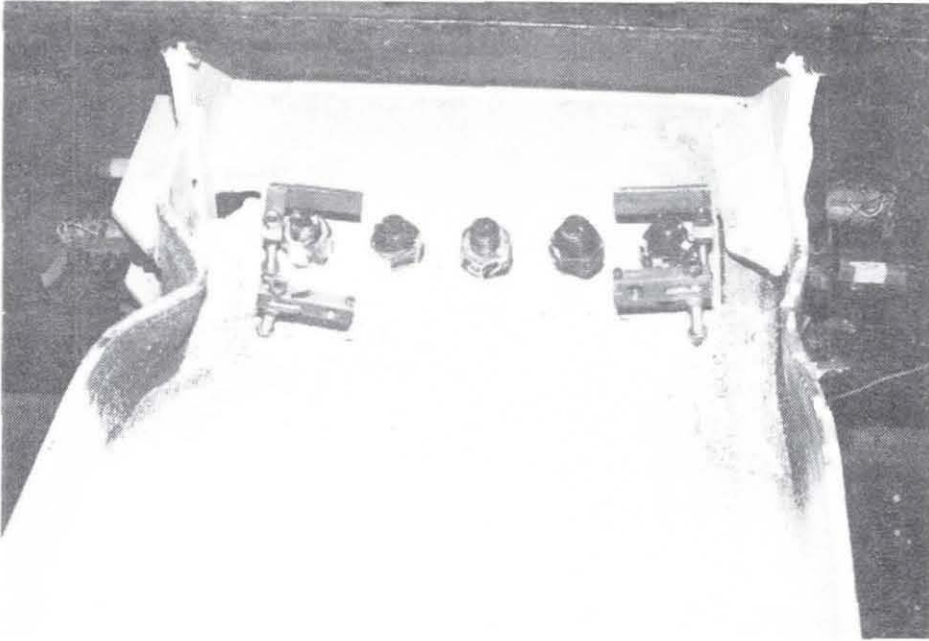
Beam Flange and Web Buckling (Specimen 8)
